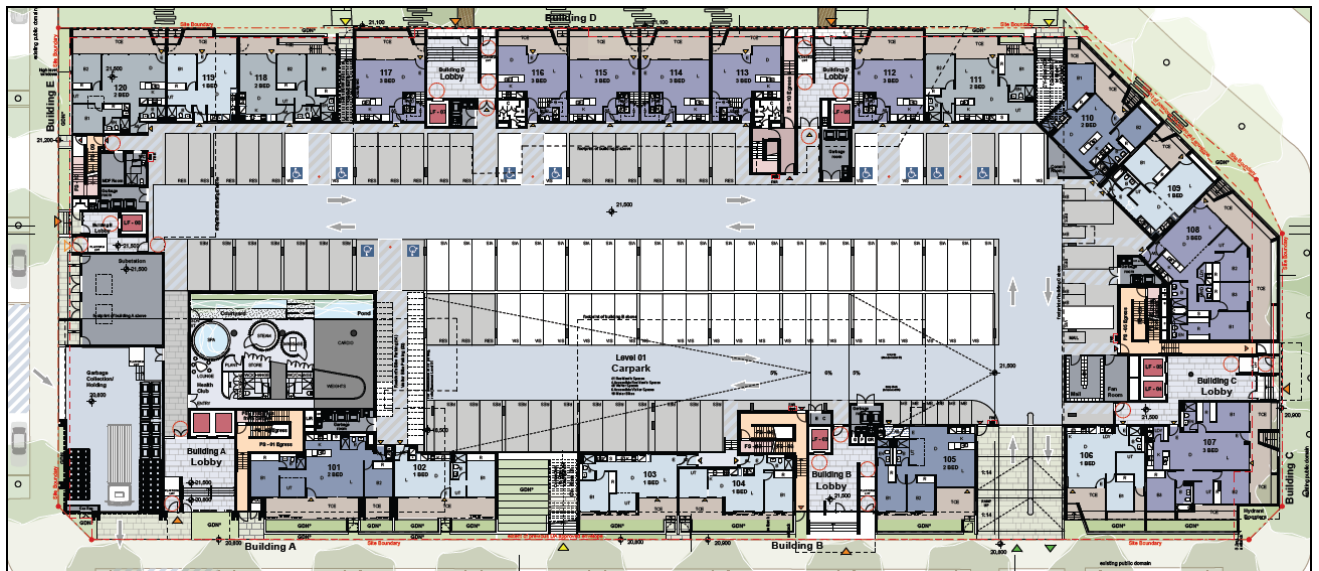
The internalised car park screened by perimeter residential dwellings at ground floor level
